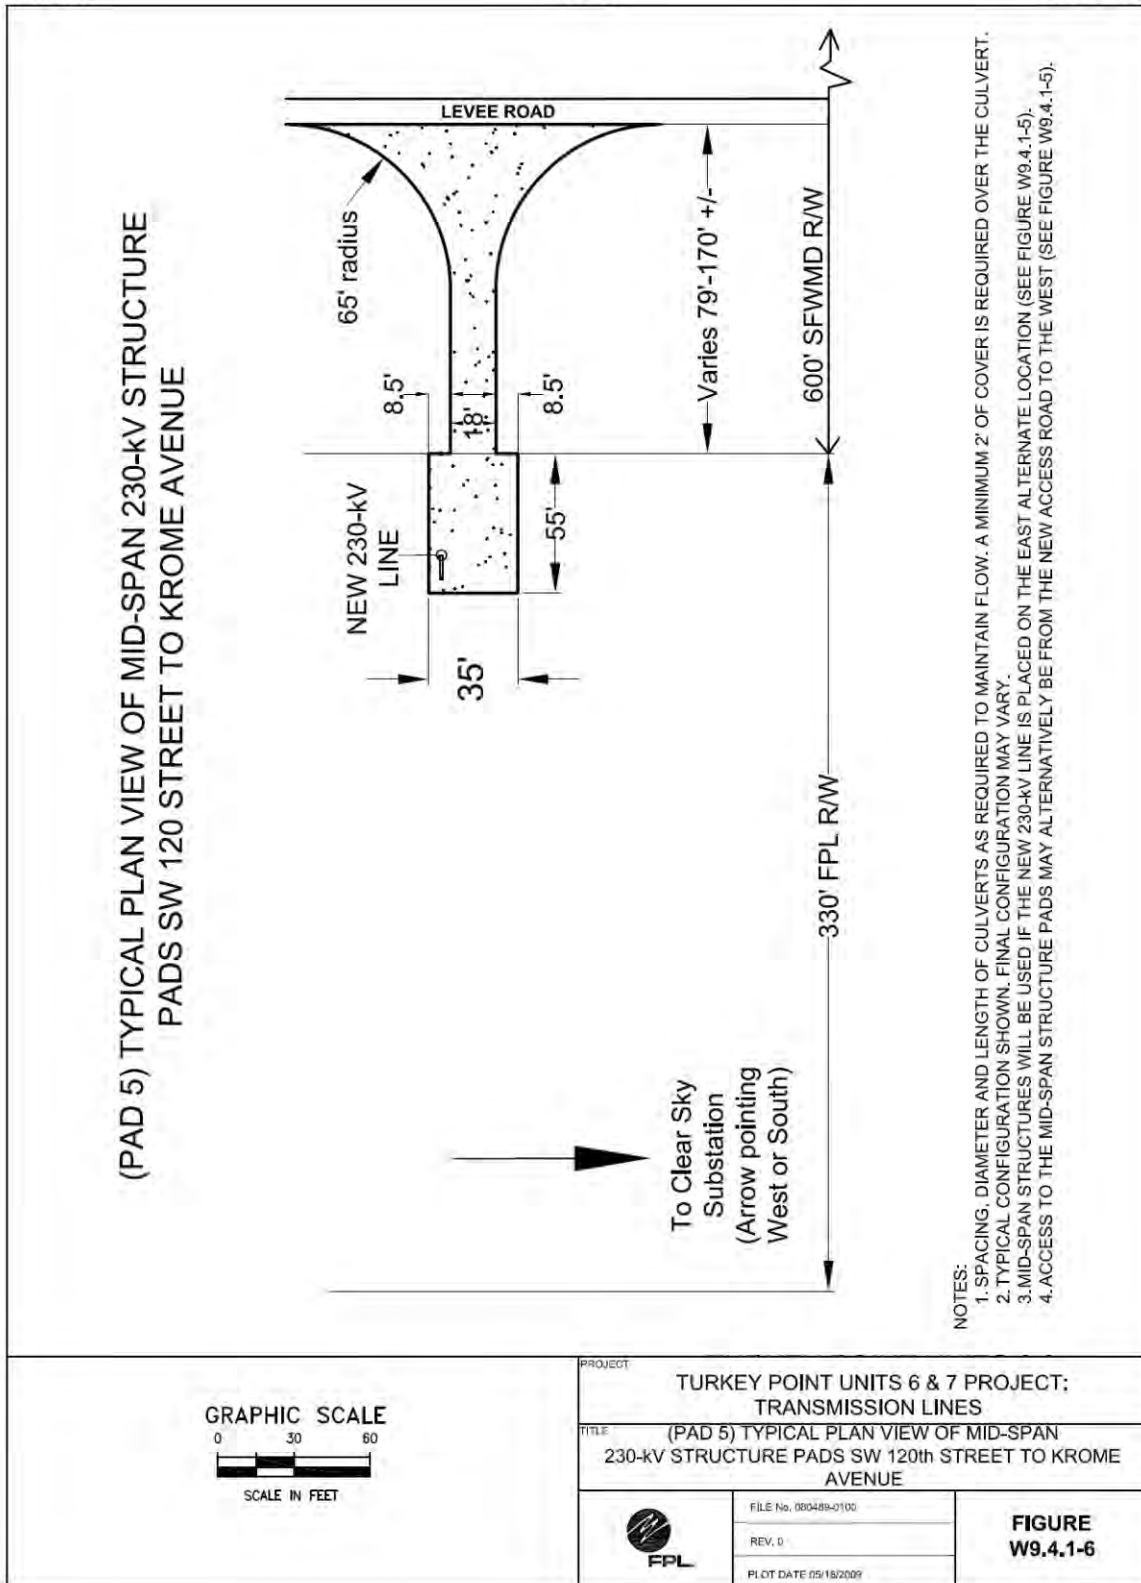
(PAD 5) TYPICAL PLAN VIEW OF MID-SPAN 230-kV STRUCTURE PADS SW 120TH STREET TO KROME AVENUE
